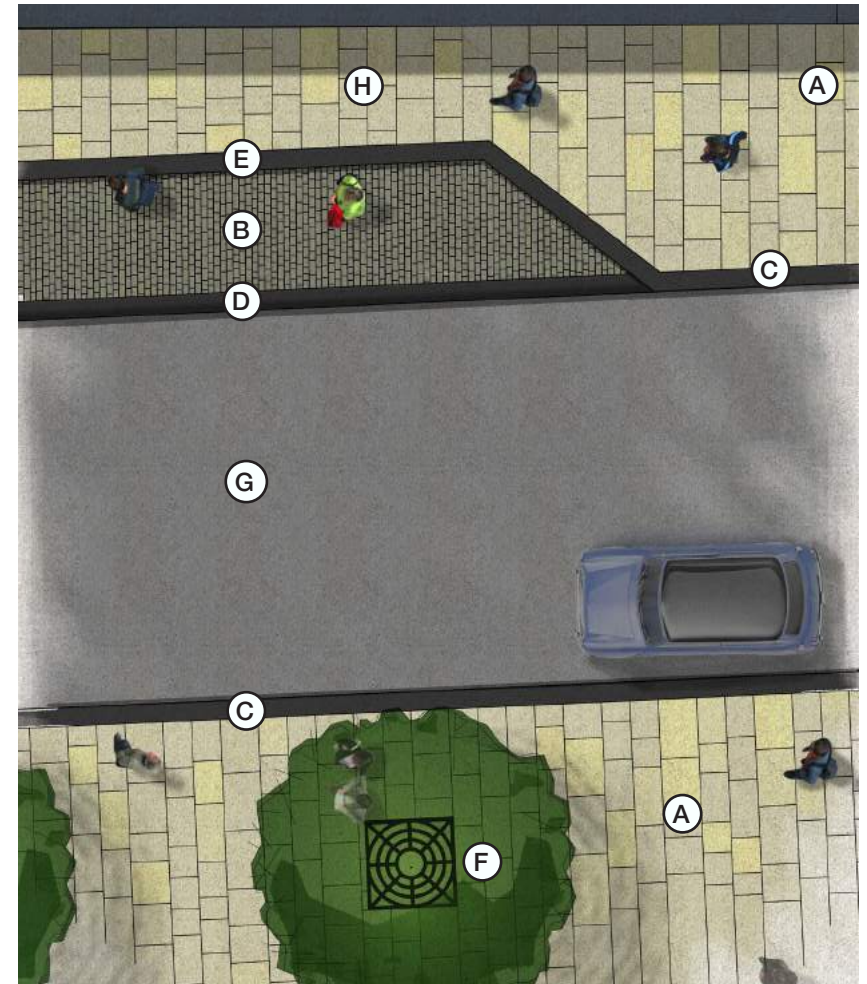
Concept sketch plan illustrating typical layout and materials of the street (Example Parliament Square/Castle Street)
